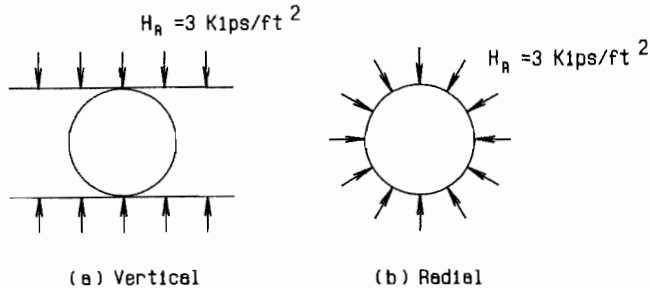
Tunnel Liners Under Load (a) Vertical and (b) Radial.
